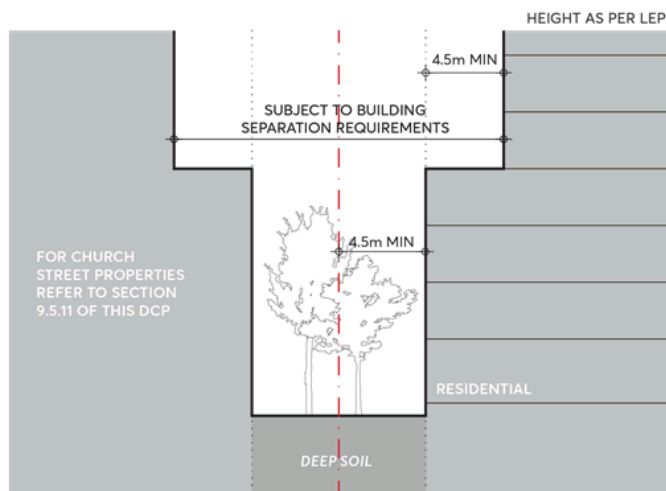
Setbacks and separation with properties fronting Church Street (site 07, site 08 and site 11)
